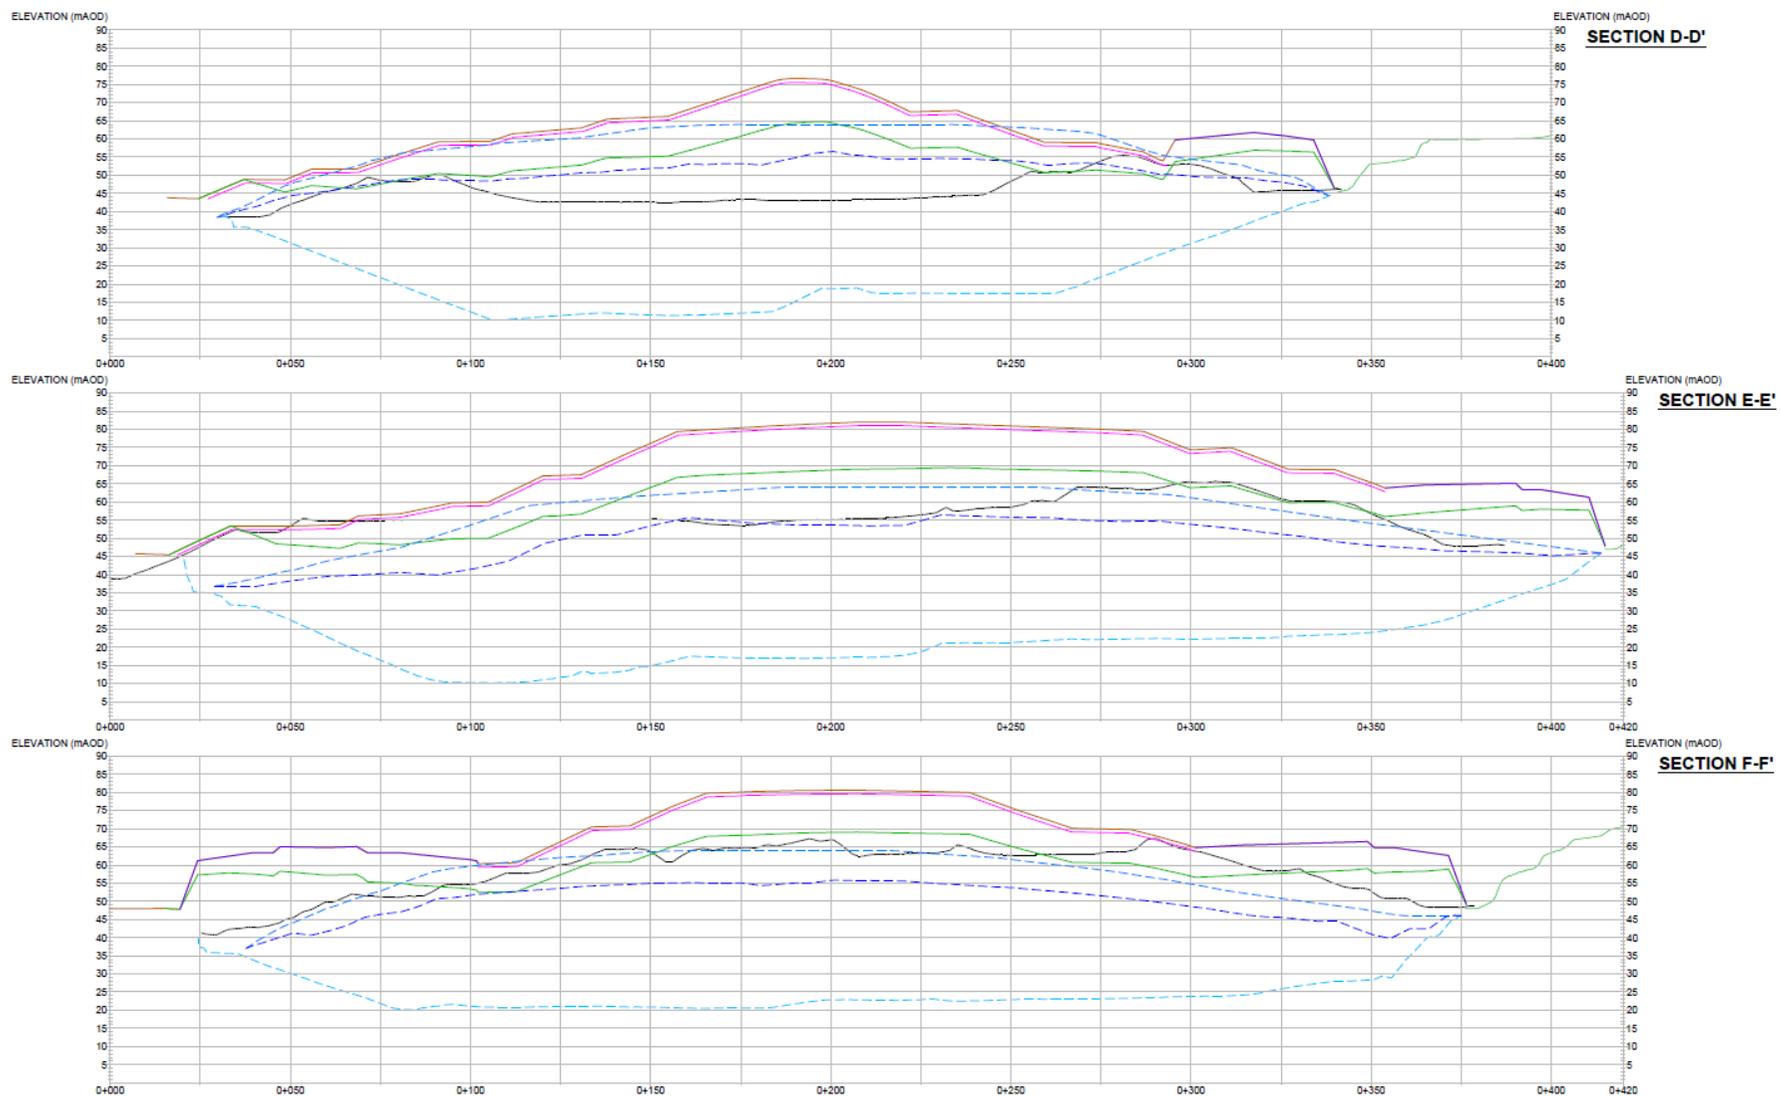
Sections of the proposed landfill (Source: PDS appendix)
